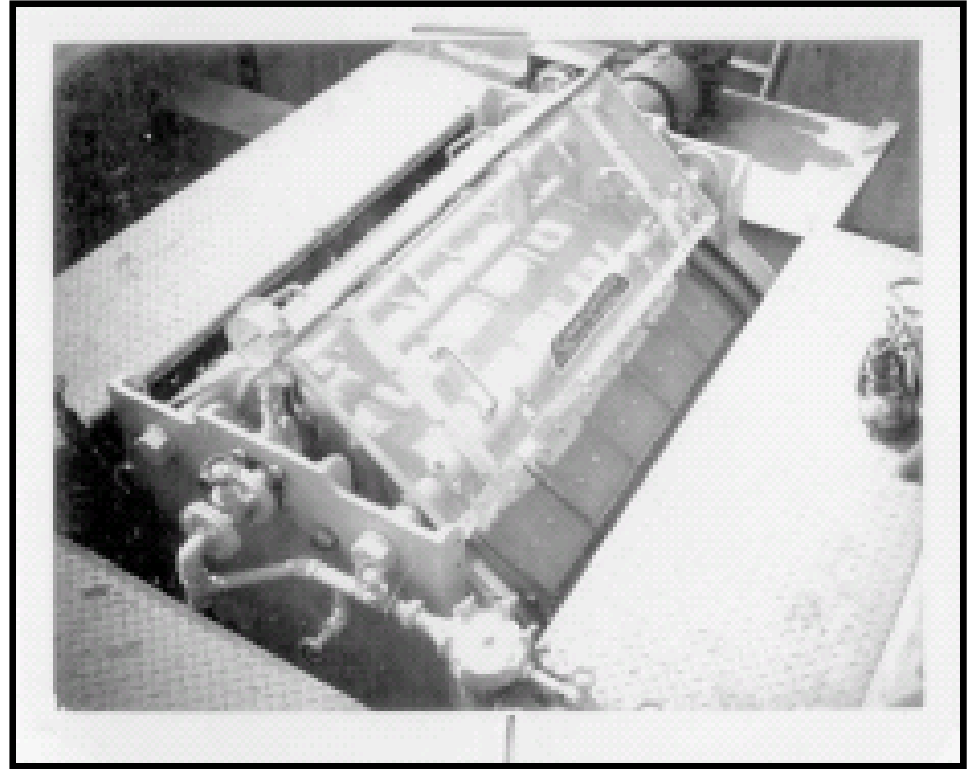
May 8, 1972 photo. View looking north from WWTP roof.
